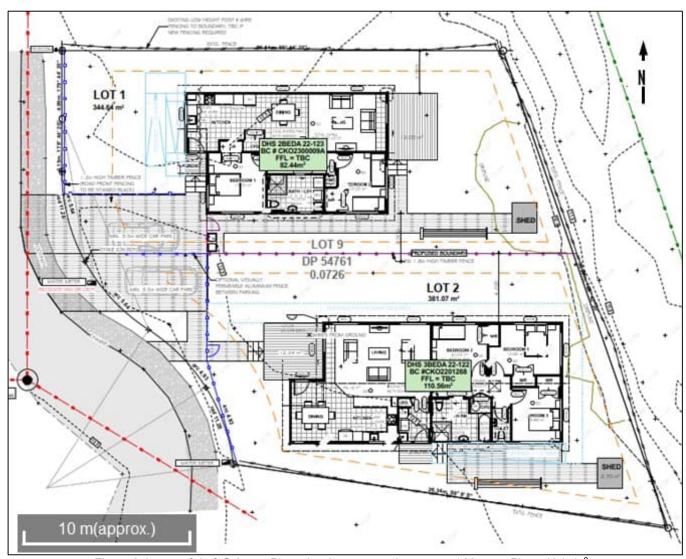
Image of draft Scheme Plan, showing proposed set out at 1 Masters Place, Kaitaia<sup>2</sup>.
